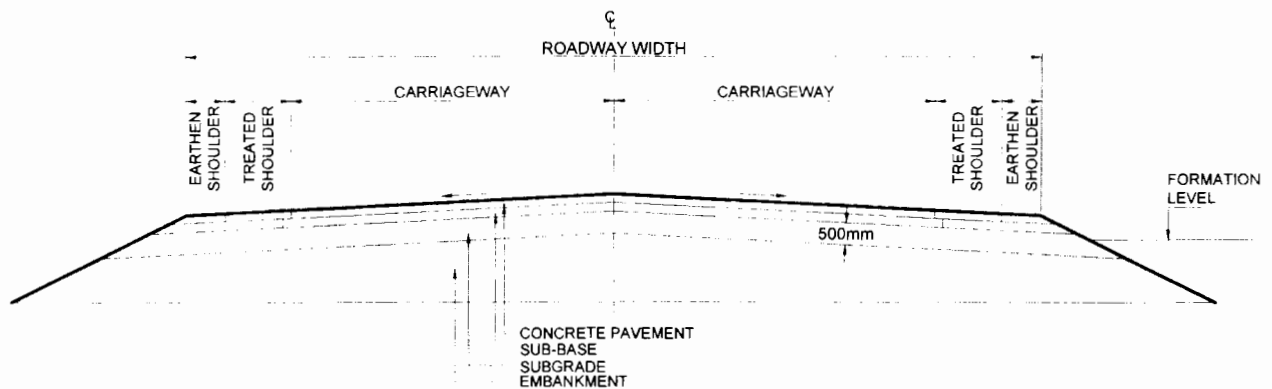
Terms Used in the Specifications to Describe Road Cross-Section Elements with a Concrete Pavement
